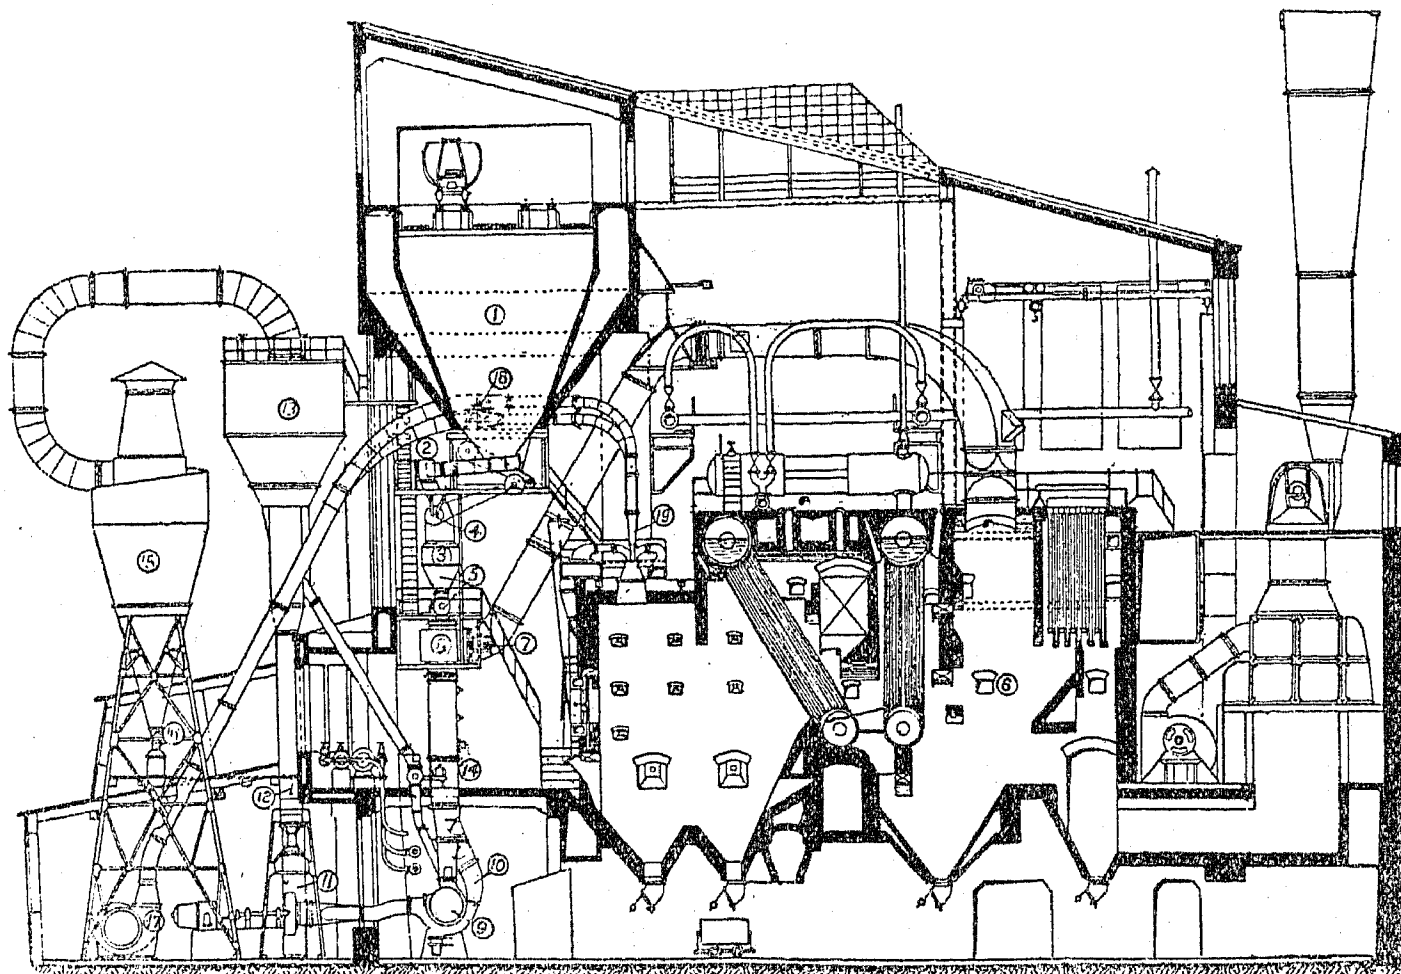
Cross-sectional view of a boiler house at Shatura, showing experimental equipment for pulverizing and burning milled peat.
